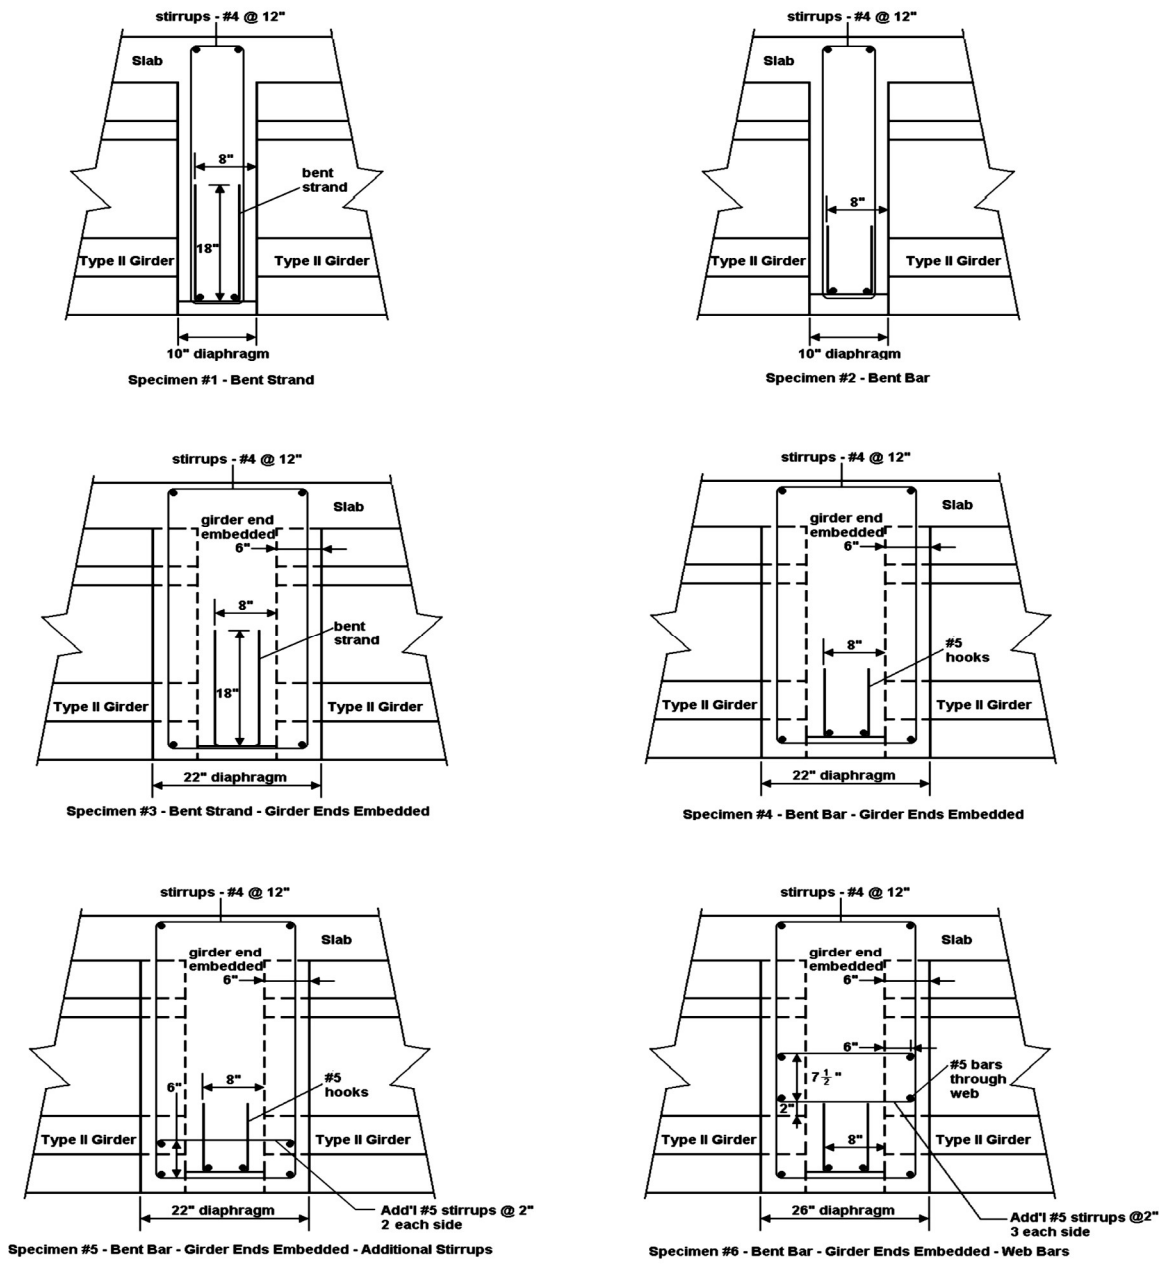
Six different connection details for on-pier splicing (Dimmerling et al., 2005).
